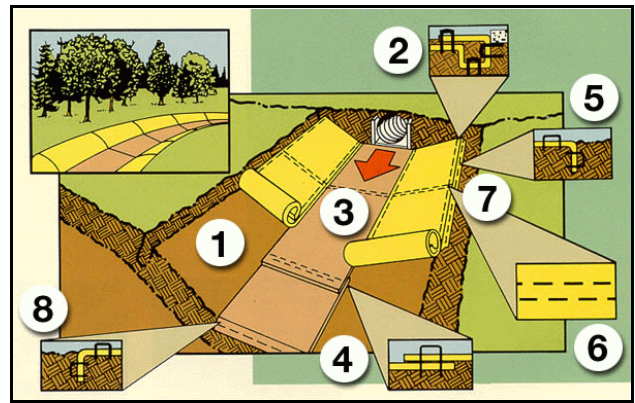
Example erosion control mat installation in a channel or drainage swale (North American Green, 2002).
